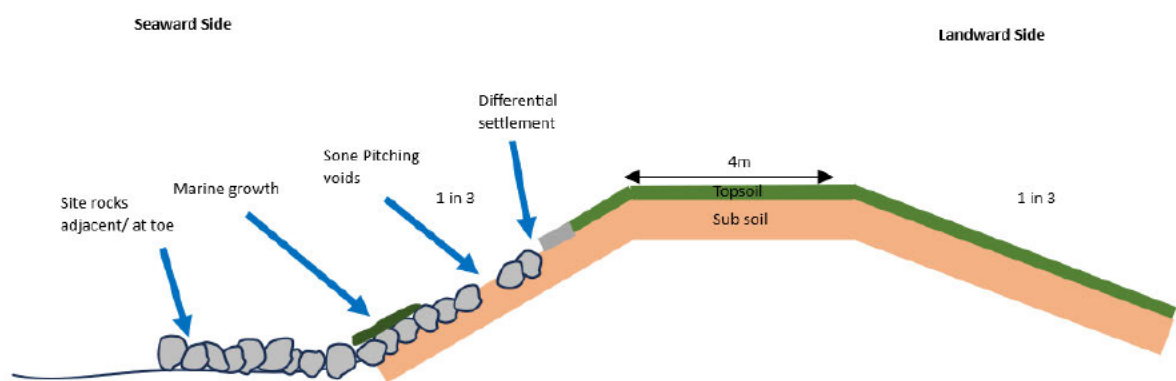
Section view, indicative sketch of voids on the stone pitching.
